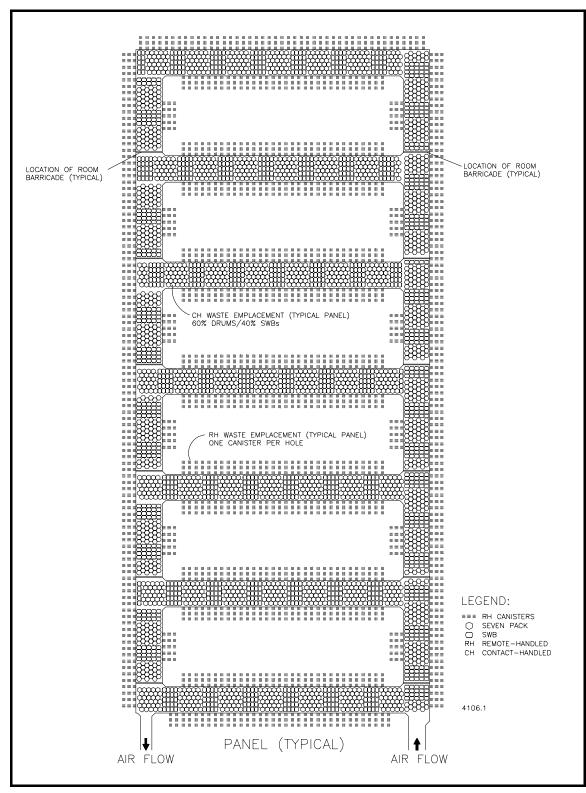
, Typical RH and CH Transuranic Mixed Waste Disposal Configuration
